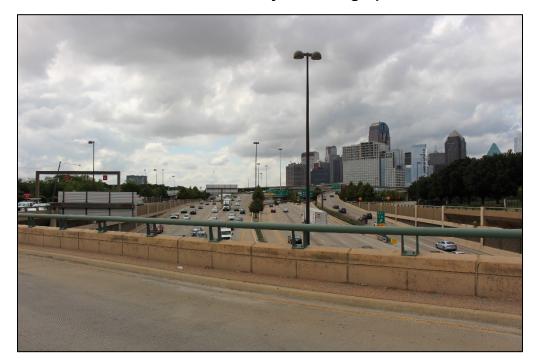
Looking south along I-345 from N. Hall St. at the northern project limits.
